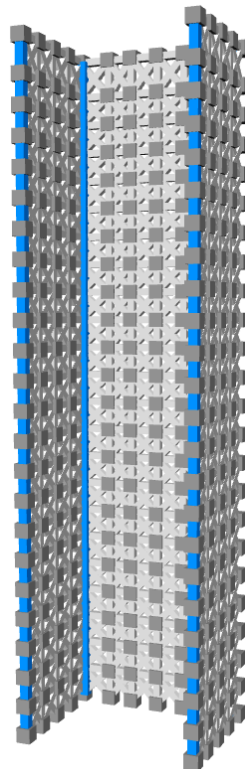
Perspective view of the beam-truss model for TUF when loaded in the West-East direction.
